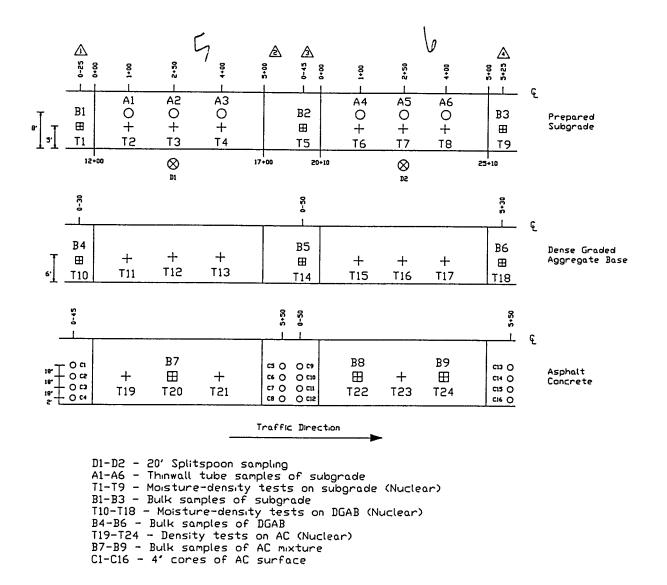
Overview of sampling, testing and coring plan for Asphalt Concrete sections on SPS-8 Montana project.
